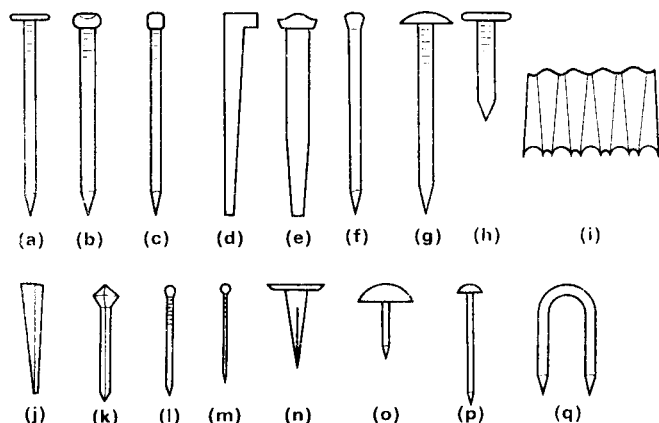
Common nails and pins. (a) French or Wire. (b) Oval (c) Lost head. (d) Cut nail. (e) Floor brad. (f) Masonry. (g) Roofing nail. (h) Clout nail. (i) Corrugated fastener. (j) Glazing sprig. (k) Hardboard nail. (l) Panel pin. (m) Veneer pin. (n) Cut tack. (o) Upholstery nail. (p) Escutcheon pin. (q) Staple.
